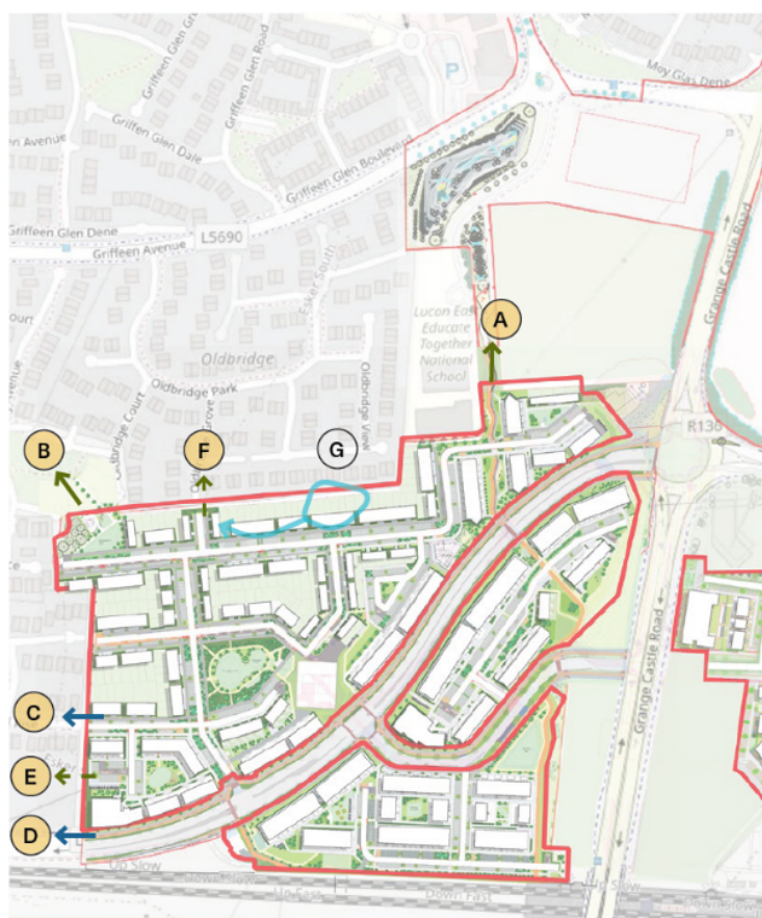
Extract from the submitted Architectural Design Statement, prepared by O'Mahony Pike Architects
